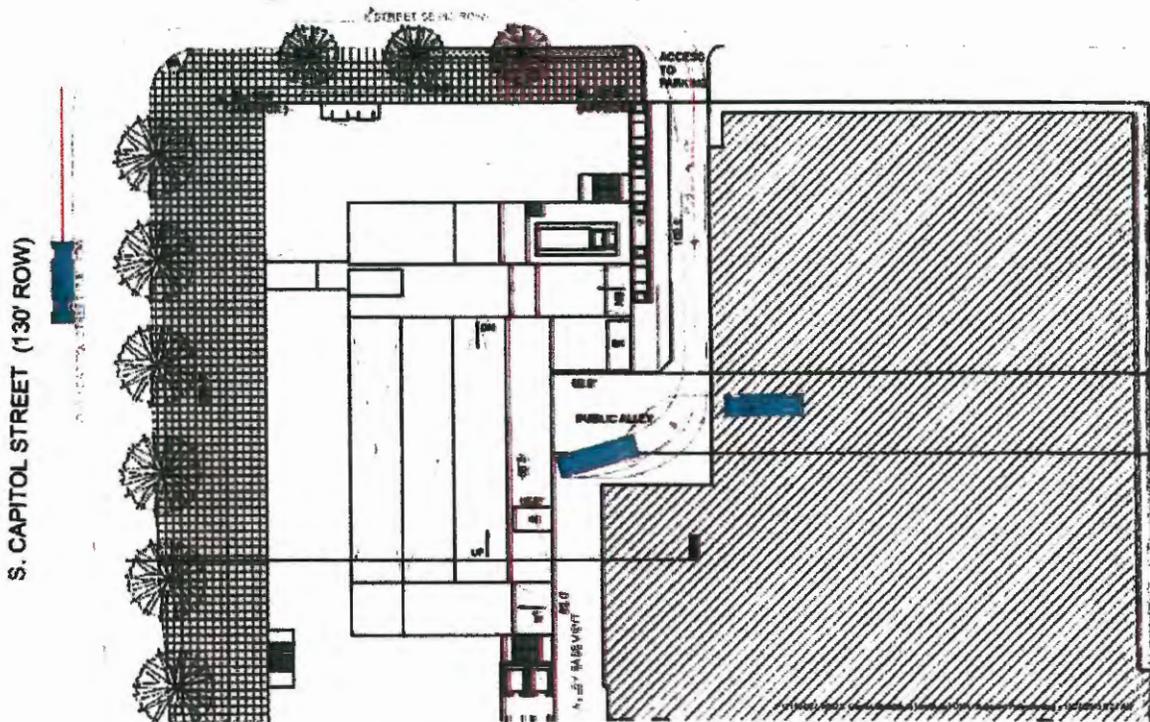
SU-30 Inbound (Source: Gorove/Slade)
